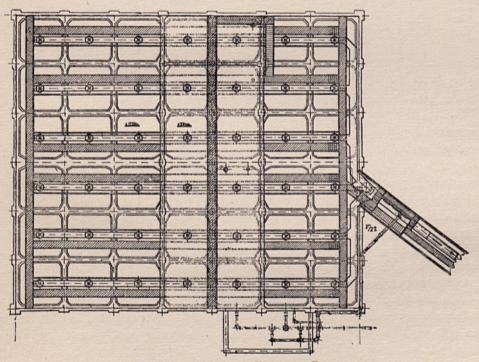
Plan of Fine-coal Drainage Bunkers.
